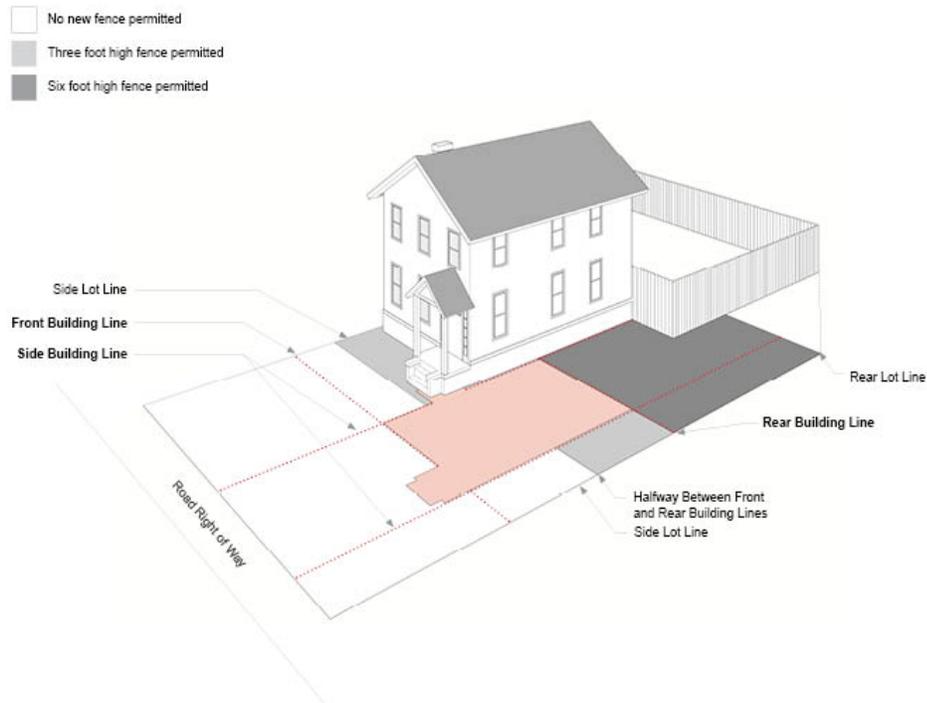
a: House on Interior Lot- Fence Behind Half-Way Point of Front and Rear Building Lines Option A
